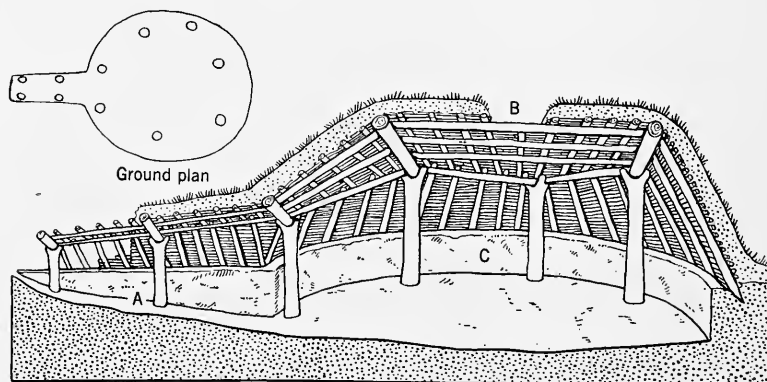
Cross section and ground plan of a prehistoric Mogollon pit dwelling: A, entrance; B, smoke hole; C, excavated earth wall. (Chicago Natural History Museum.)
